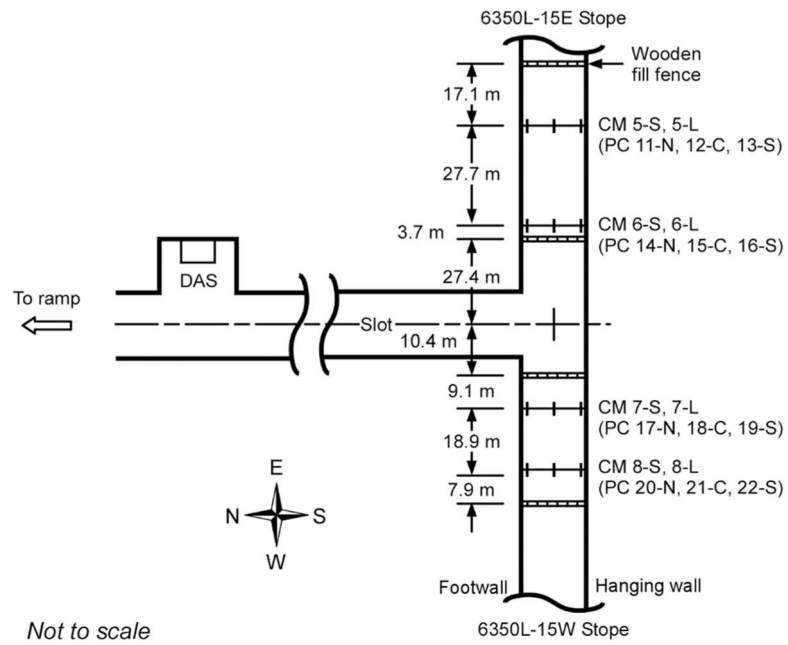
Plan view of 6350 level (1935 m below shaft collar), 15-stope backfill instrumentation sites (L denotes a full-span closure meter, and S denotes a half-span closure meter)
